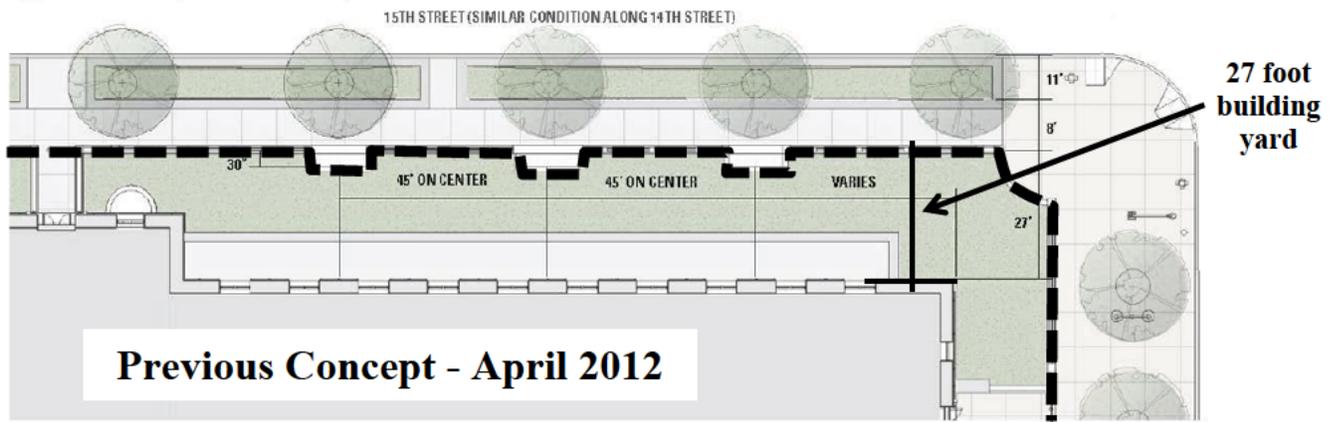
Concept Site Plan Detail (April 2012) – 15th Street, NW
